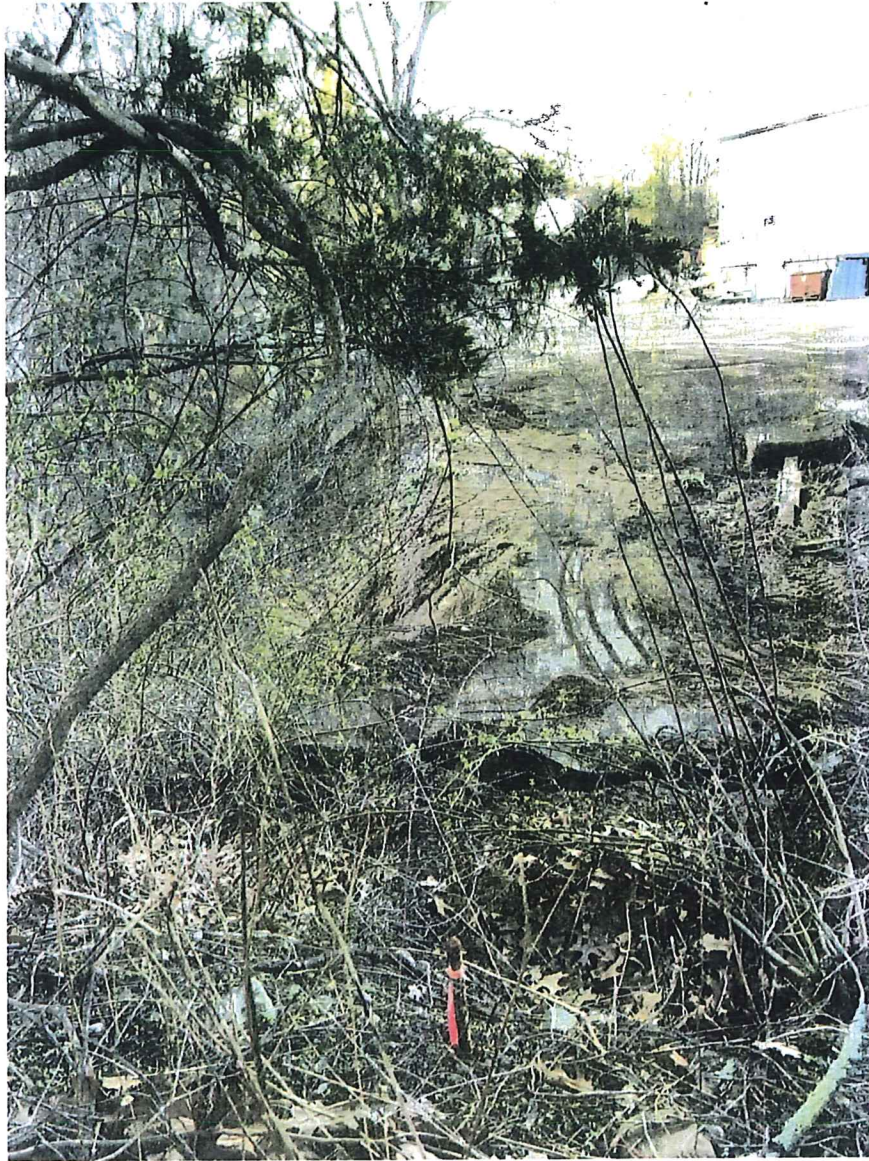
View of looking north along common property line between 217 (left side of photo) and 227 Cocasset Street (right side of photo) after removal of 4-inch pipe shown in Photos #1 and #2. Note property corner stake in bottom center, and disturbed slope on 217 Cocasset.
